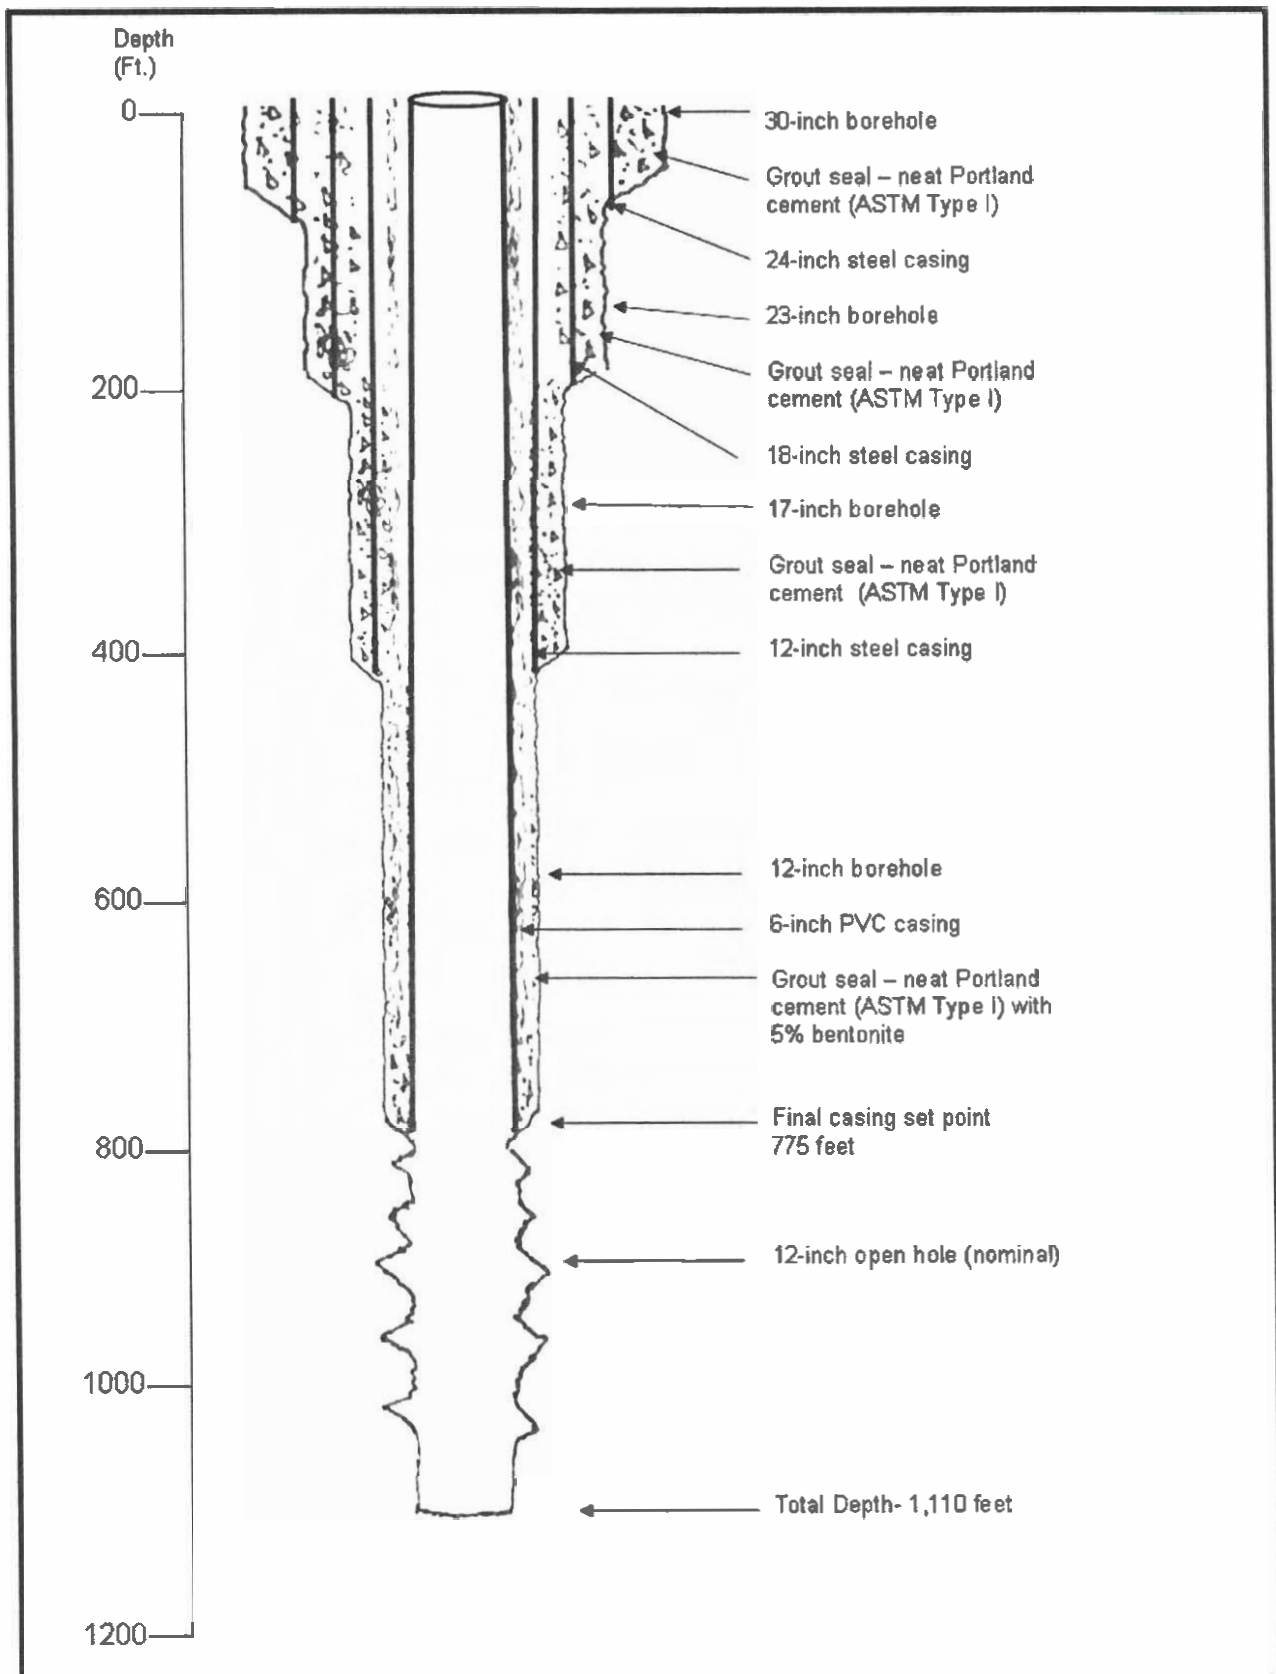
Exploratory Test Well ETW-1 Construction Diagram
